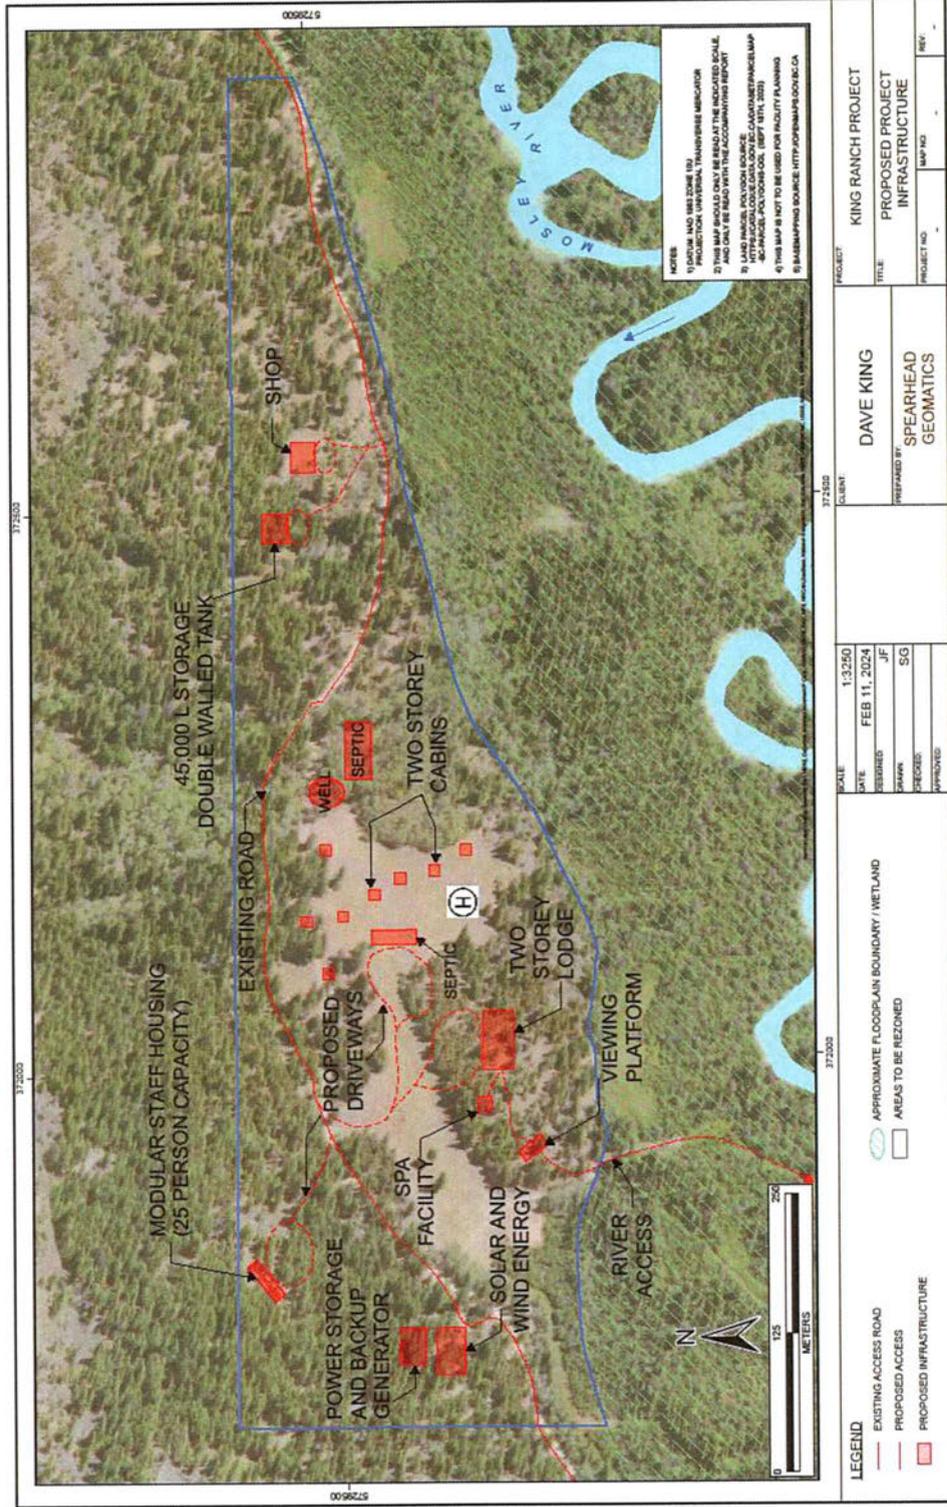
Site Plan of Mosley Creek Floodplain and Main Access Road
